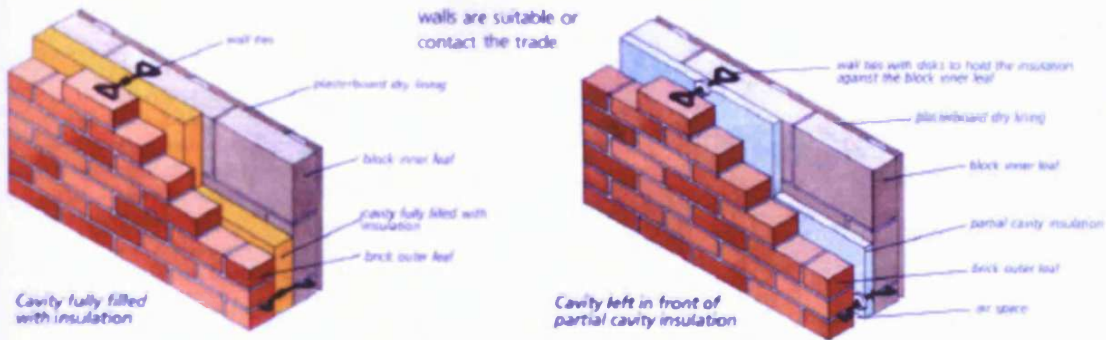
Typical external wall constructions (blockwork) (NHBC, 2000)
